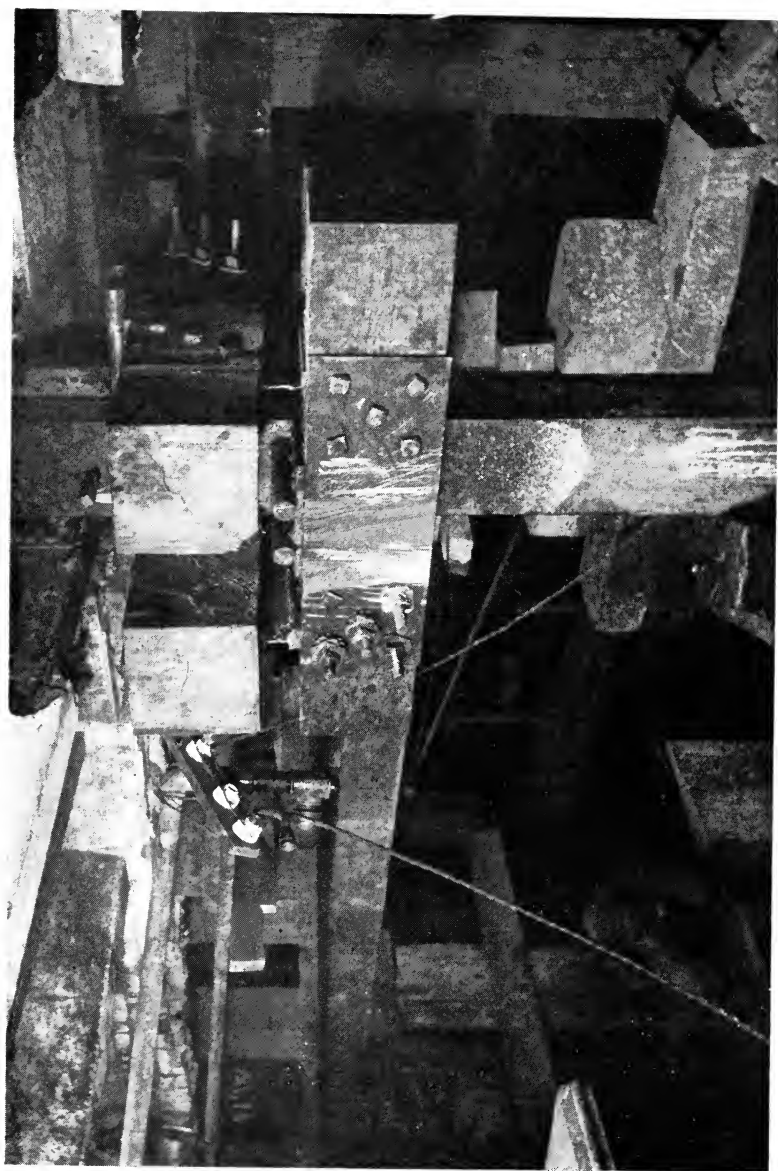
Clamp on Square Cast-Iron Column of 250 Tons Load before Being Concreted in
